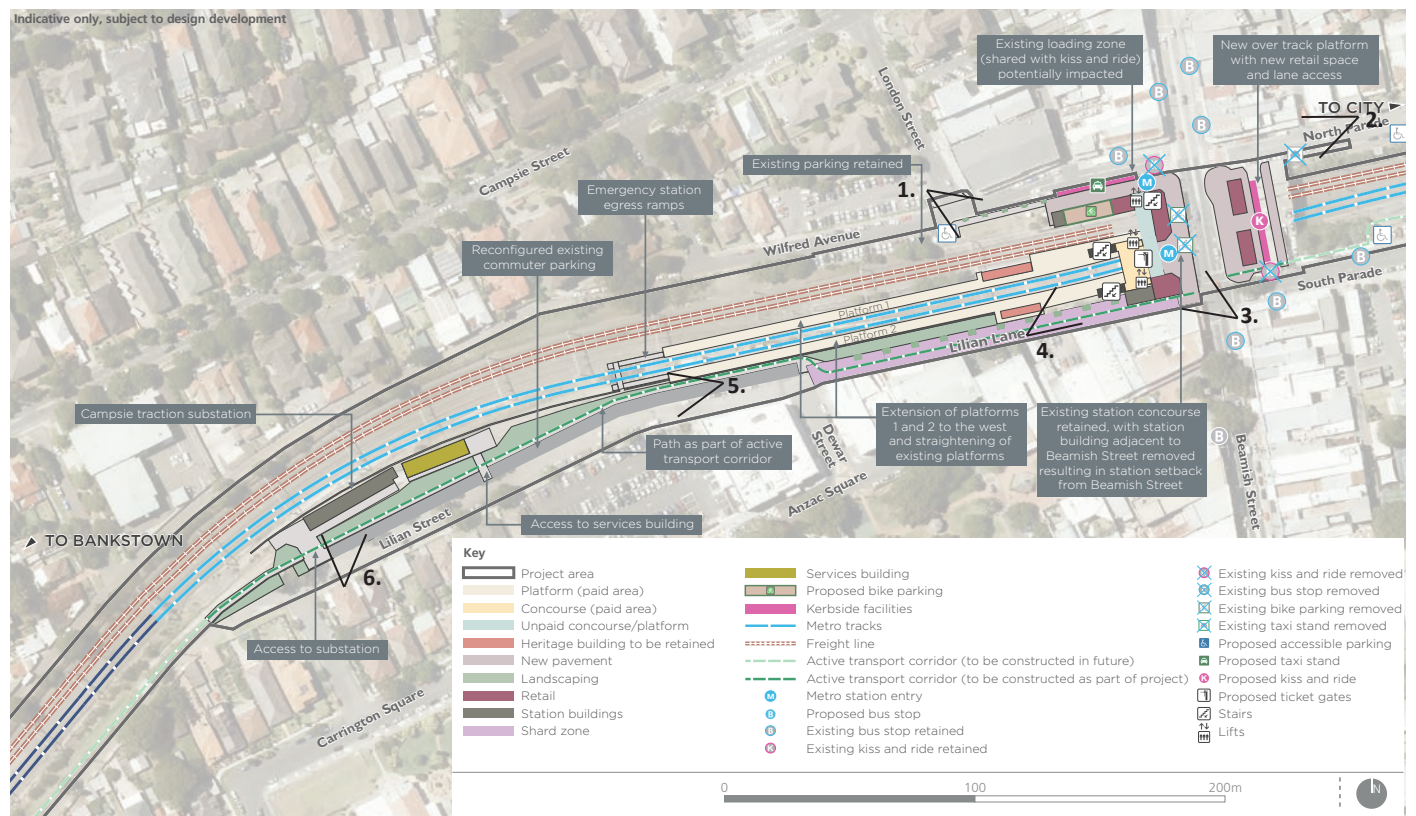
VIEWPOINT LOCATION PLAN
